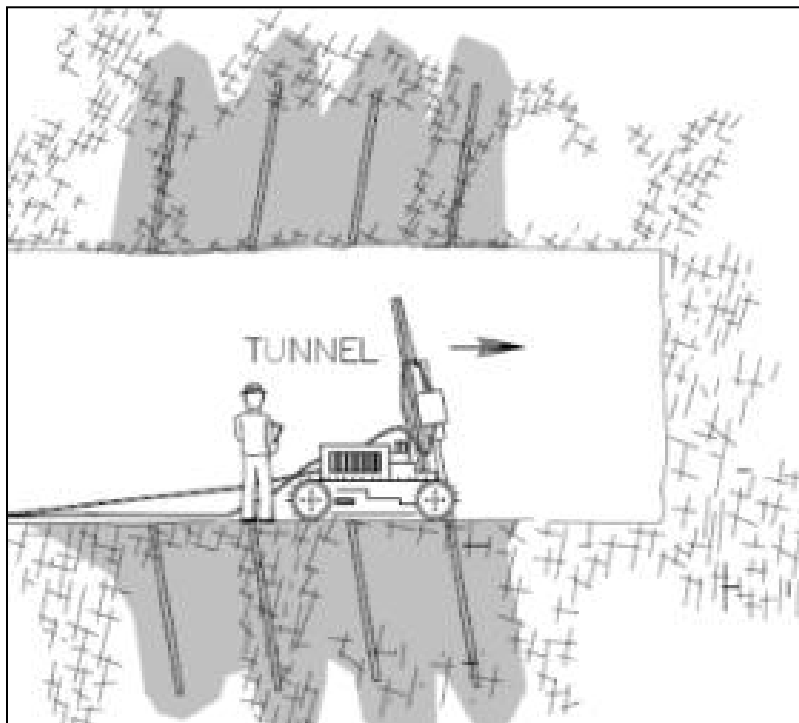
Post-consolidation grouting behind tunnel excavation.
